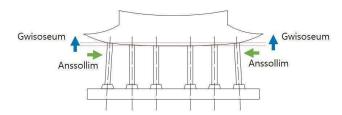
Gwisoseum and Anssollim. To provide structural stability without making the roof appear to be drooping, Anssollim, in which the columns are inclined inward to the center of the plane, and Gwisoseum, in which the columns at the corners of the hanok are slightly higher than the other columns, are used.
